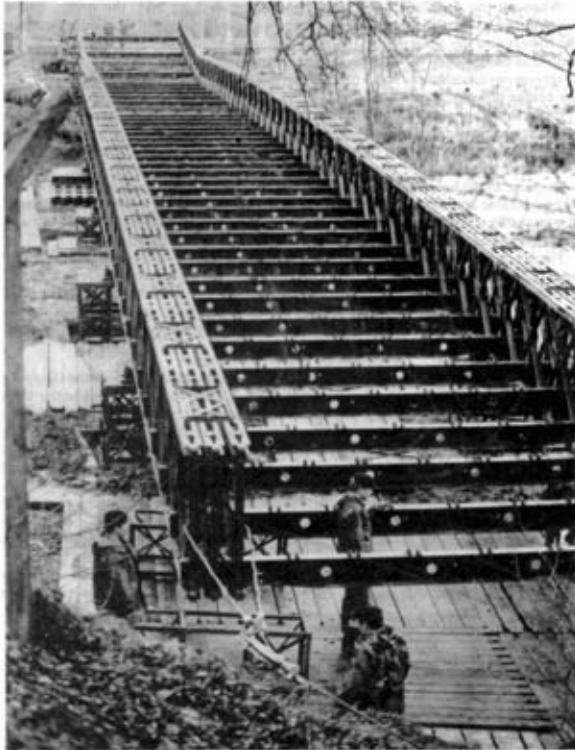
The Bailey Bridge boomed back ready for the strip. Note the restricted site and the cables connected to the winch vehicle off-site
